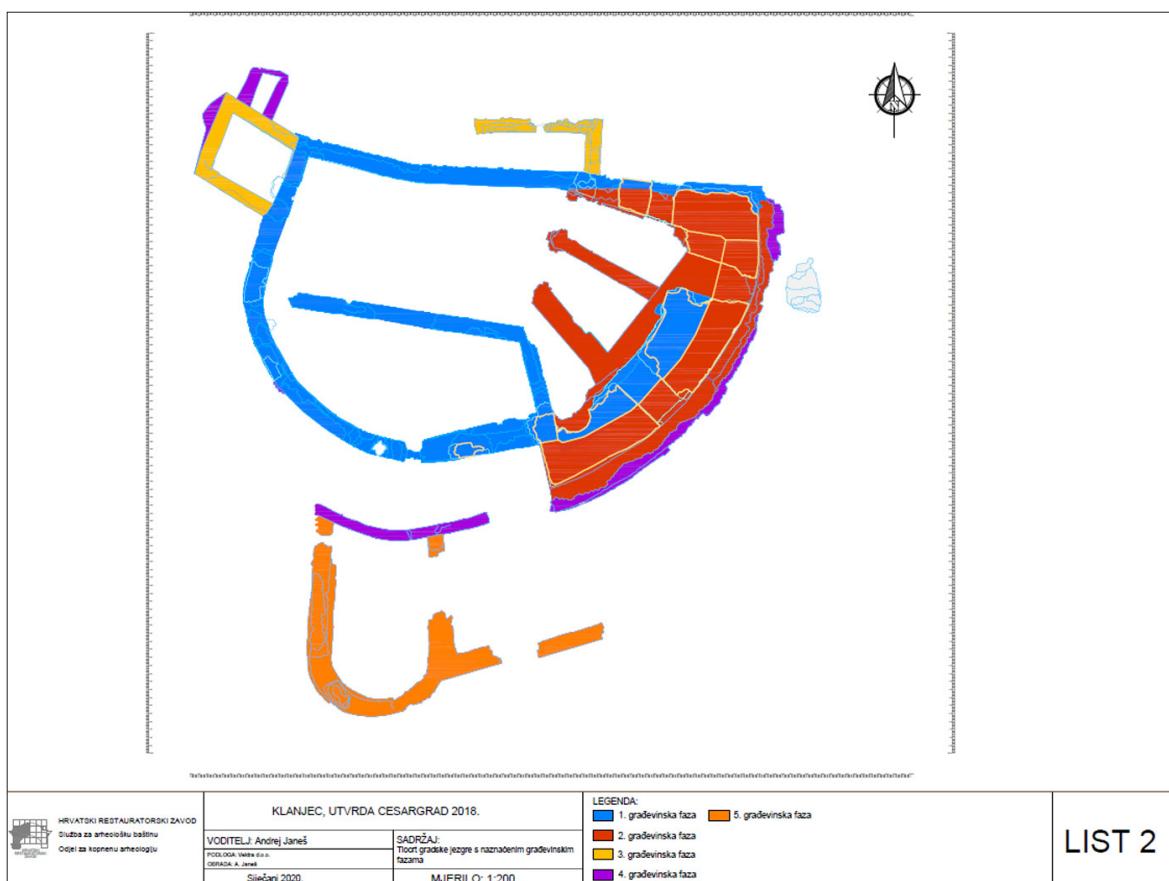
Cesargrad ground plan with construction phases (plan by: Vektra Ltd, edited by: A. Janeš).
